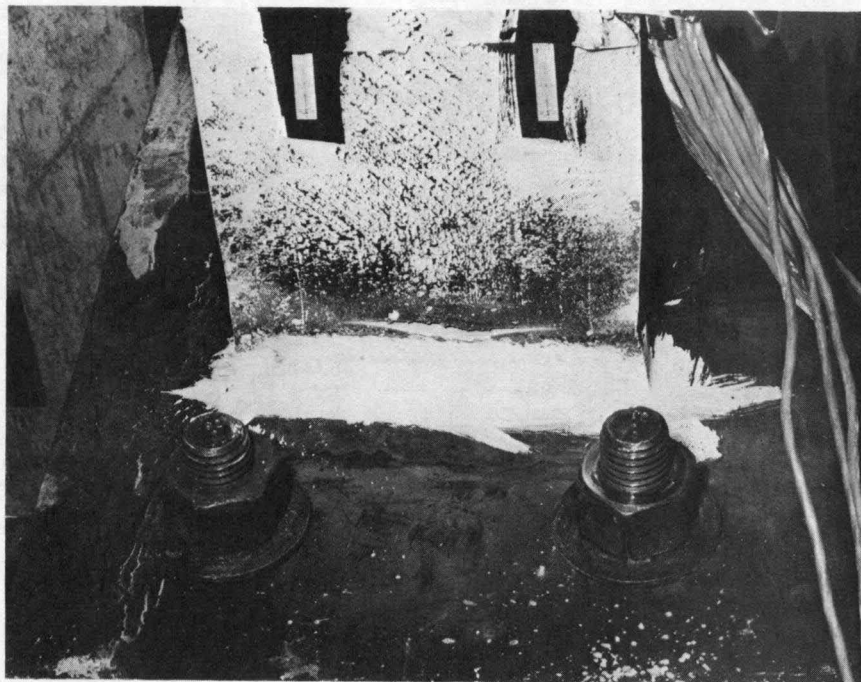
CRACKING OF THE TENSION FLANGE OF
